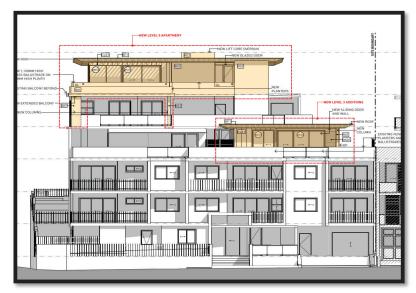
Elevation view from Farm Street. The proposed additions are shown coloured comprising an additional apartment (top left) to create new Level 5. This creates a covered area for part of the Unit 19 external courtyard. And extension of Unit 21 from a studio to 2 bedroom apartment (right).
